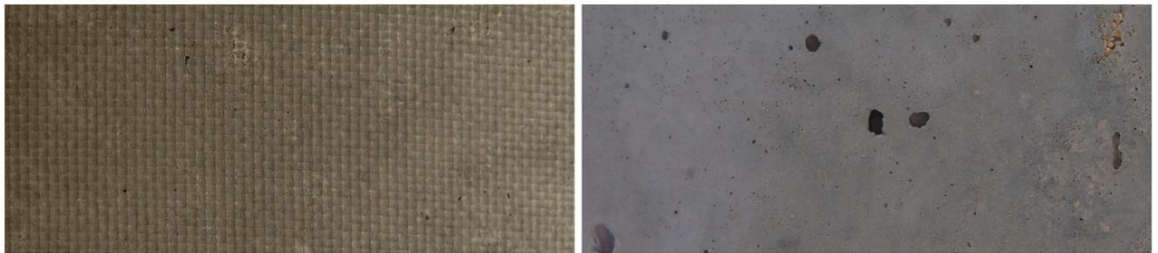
Fabric-formed concrete surface (left), timber-formed concrete surface (right) (Orr, 2012)
